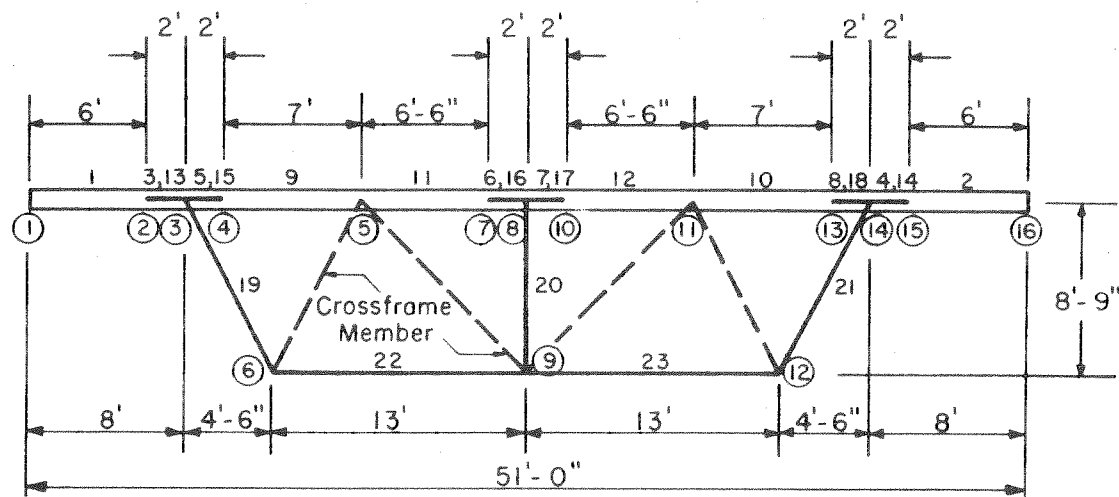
DIMENSIONS, STRESSES AND LOADING FOR COLLEGE AVENUE UNDERCROSSING
